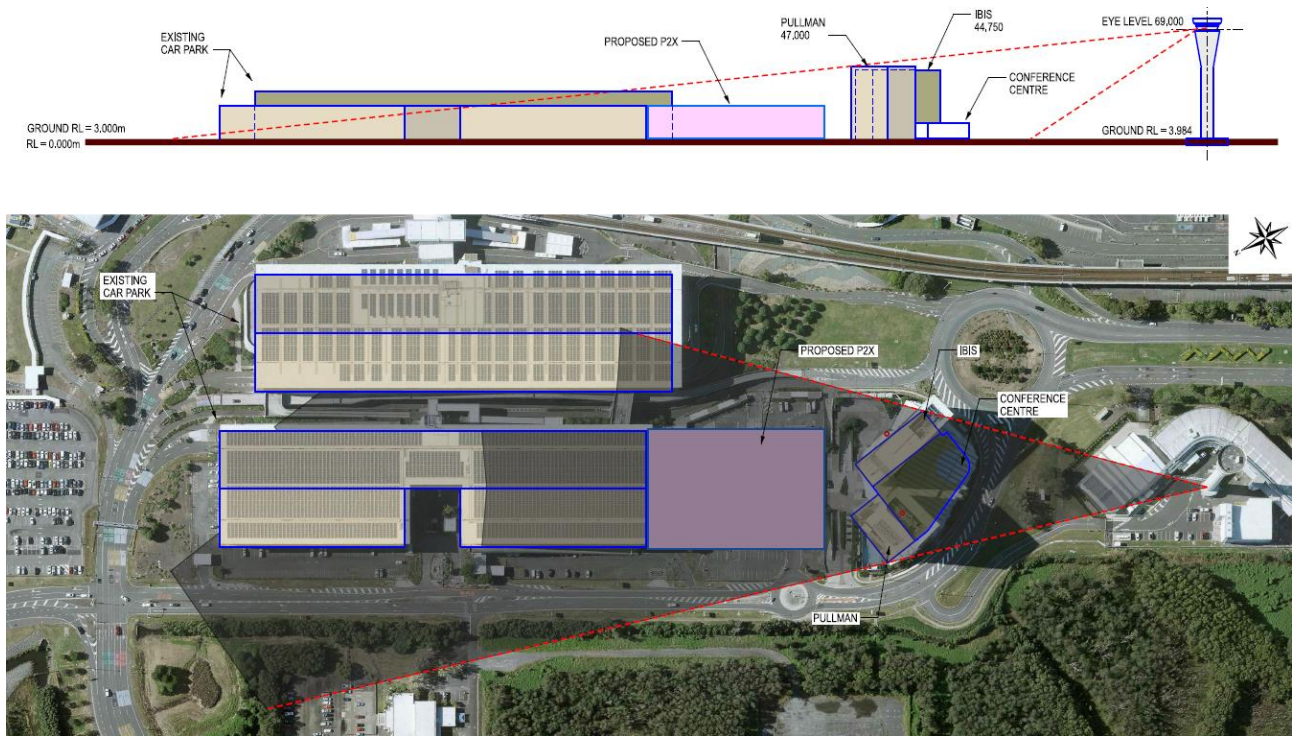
Air traffic control tower line of sight – elevation and detailed plan
